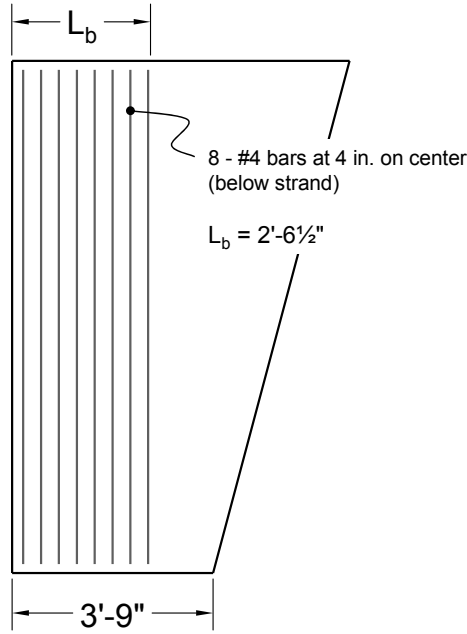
Layout of #4 Deformed Bars in PC Panel with 15° Skew
